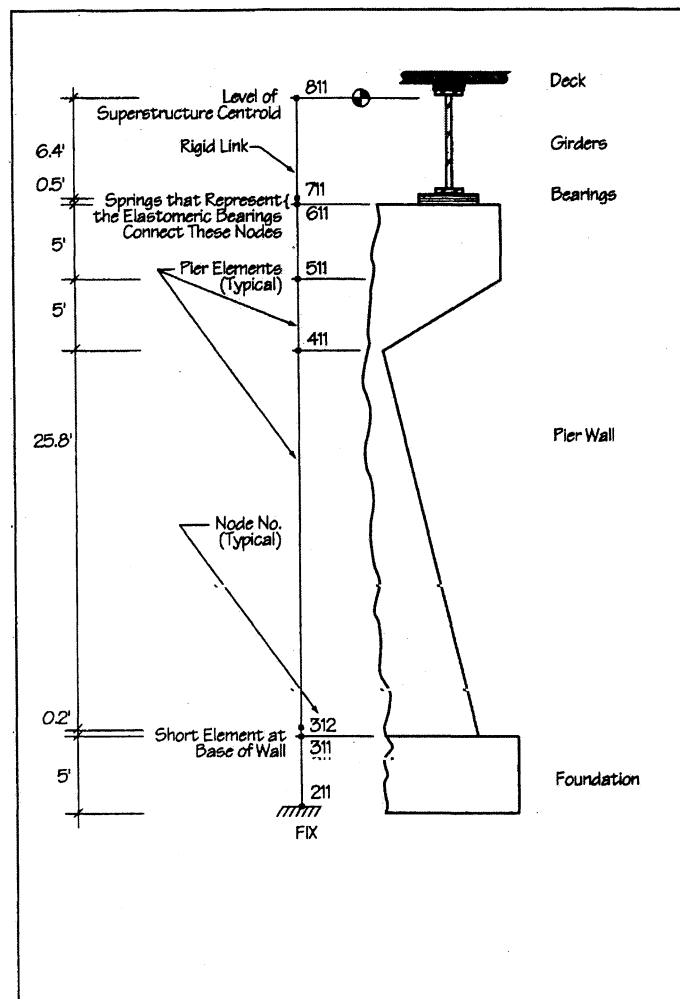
Bridge No. 2 - Details of Column Elements
